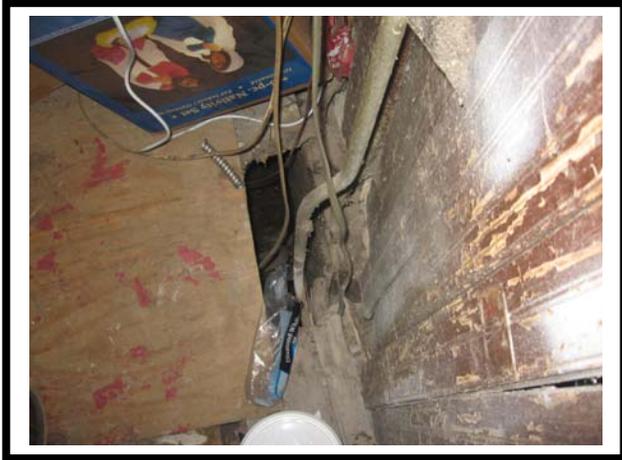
Termite damage and the floor is unsafe to walk on at this area.
